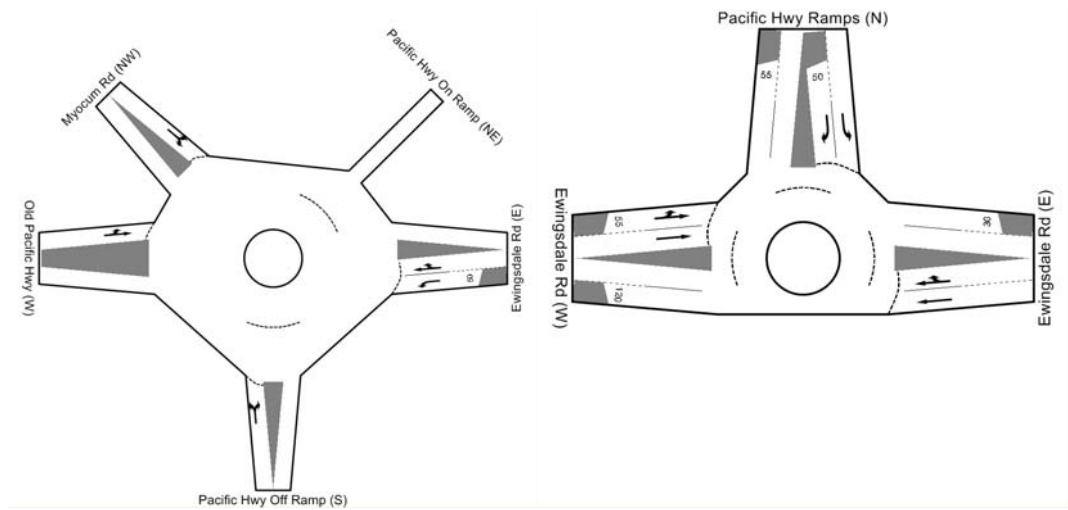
Upgraded highway + new western roundabout + additional NB on-ramp (2B)
